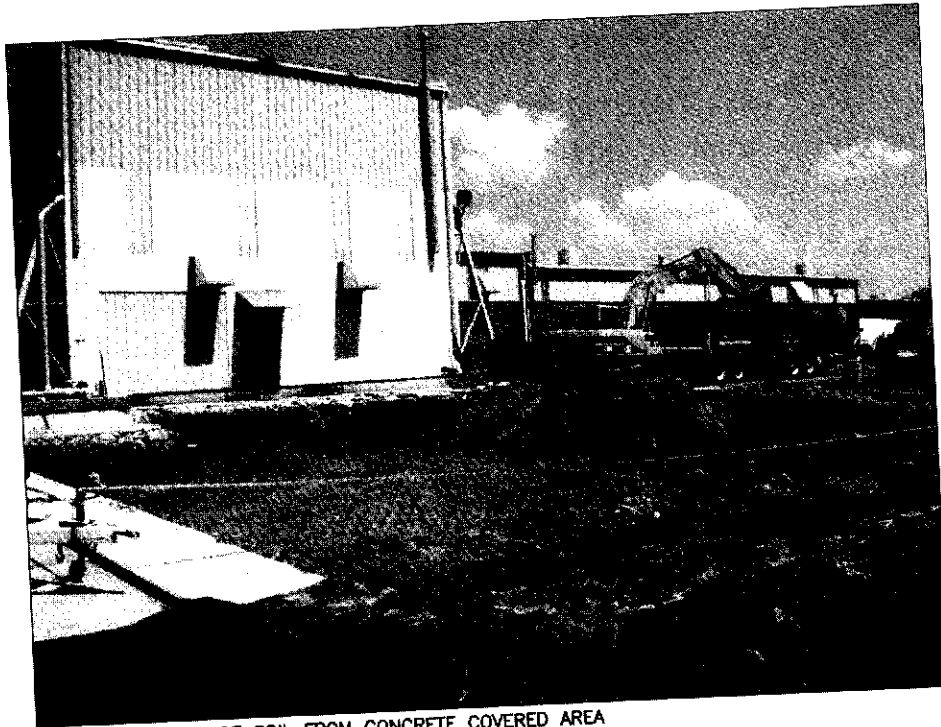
FURTHER REMOVAL OF SOIL FROM CONCRETE COVERED AREA
